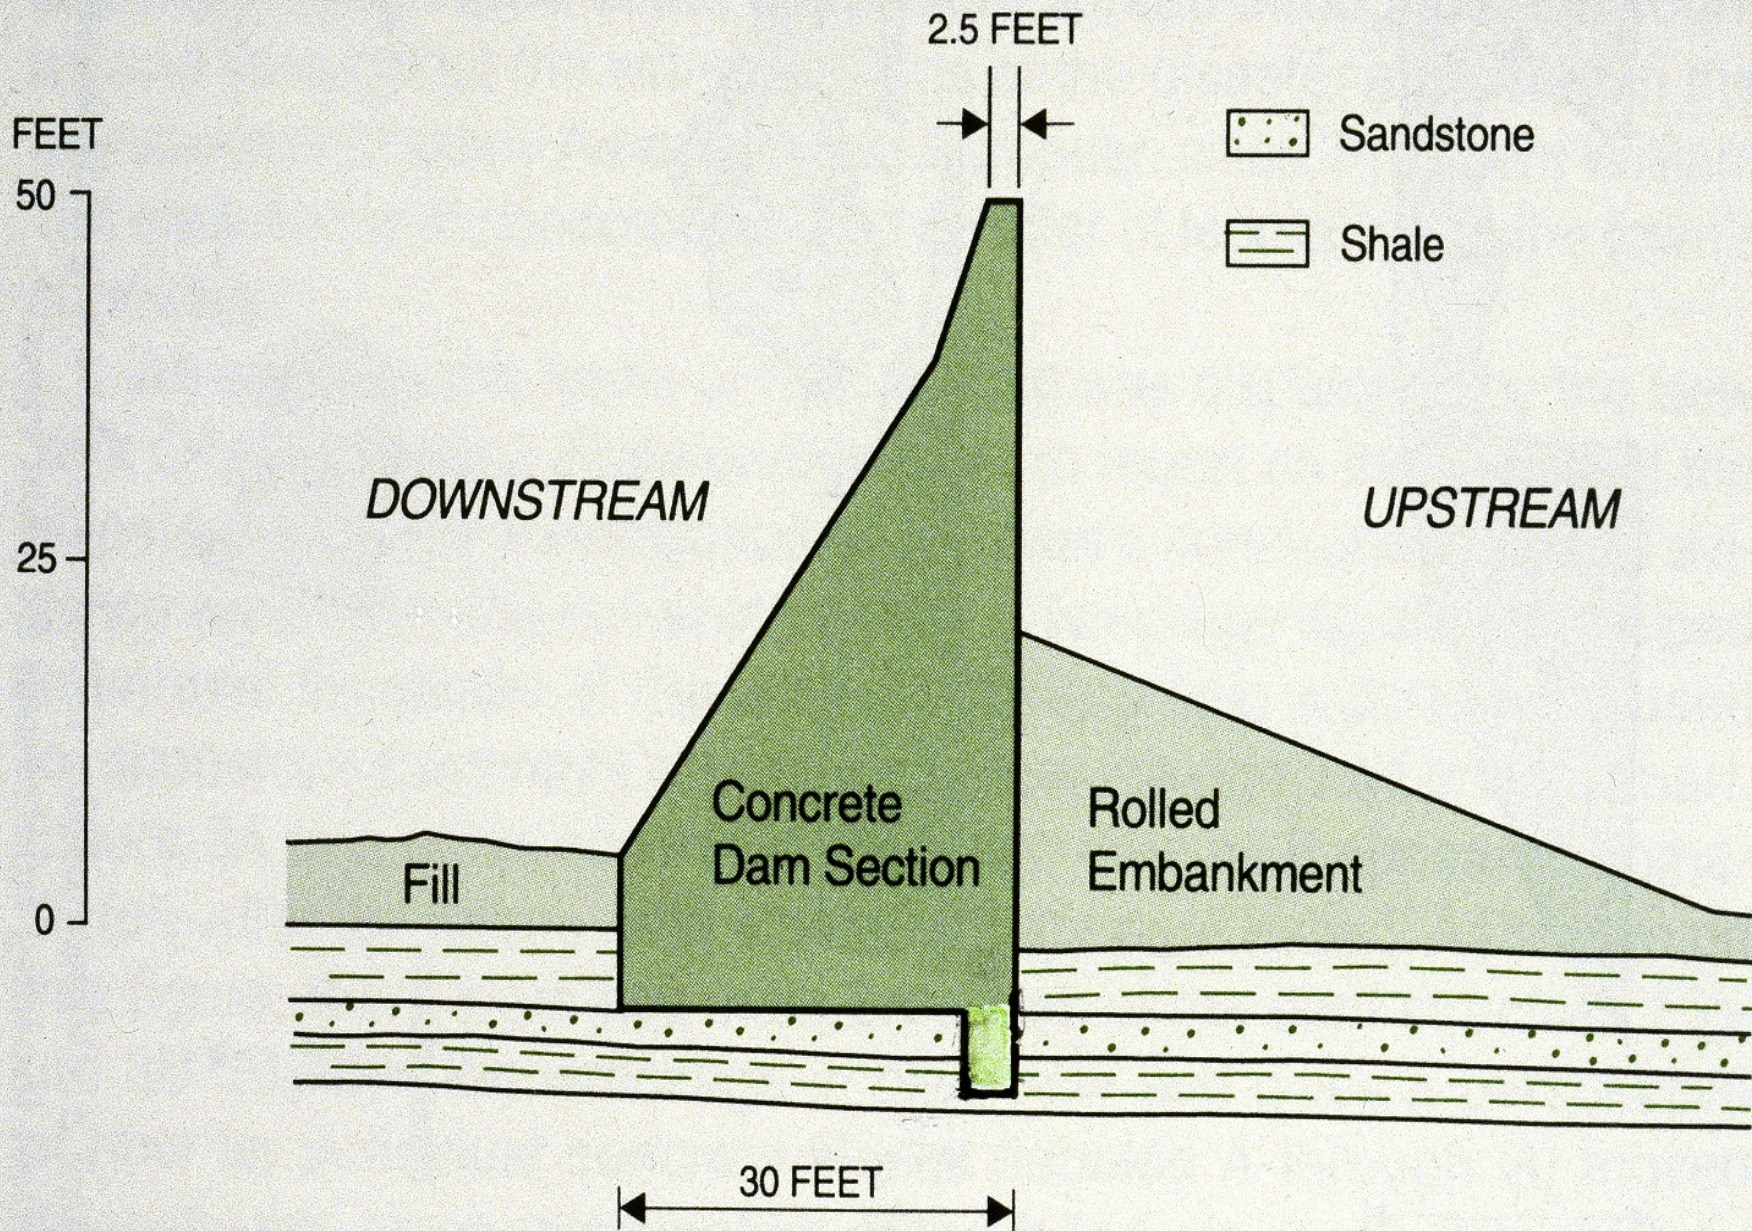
Prefailure cross section of Austin Dam at Block "D."
